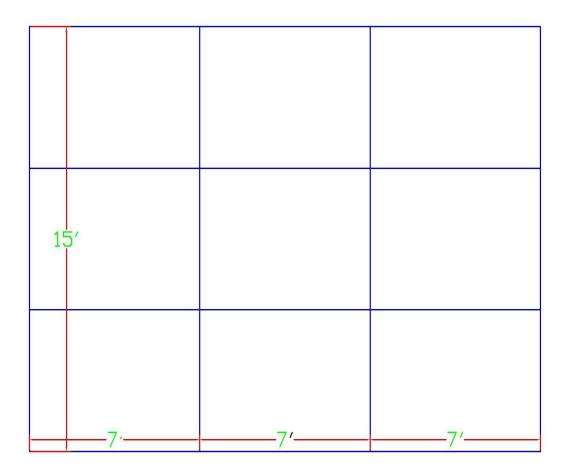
Plan at a Ground Floor of The Building Shown in The Study
